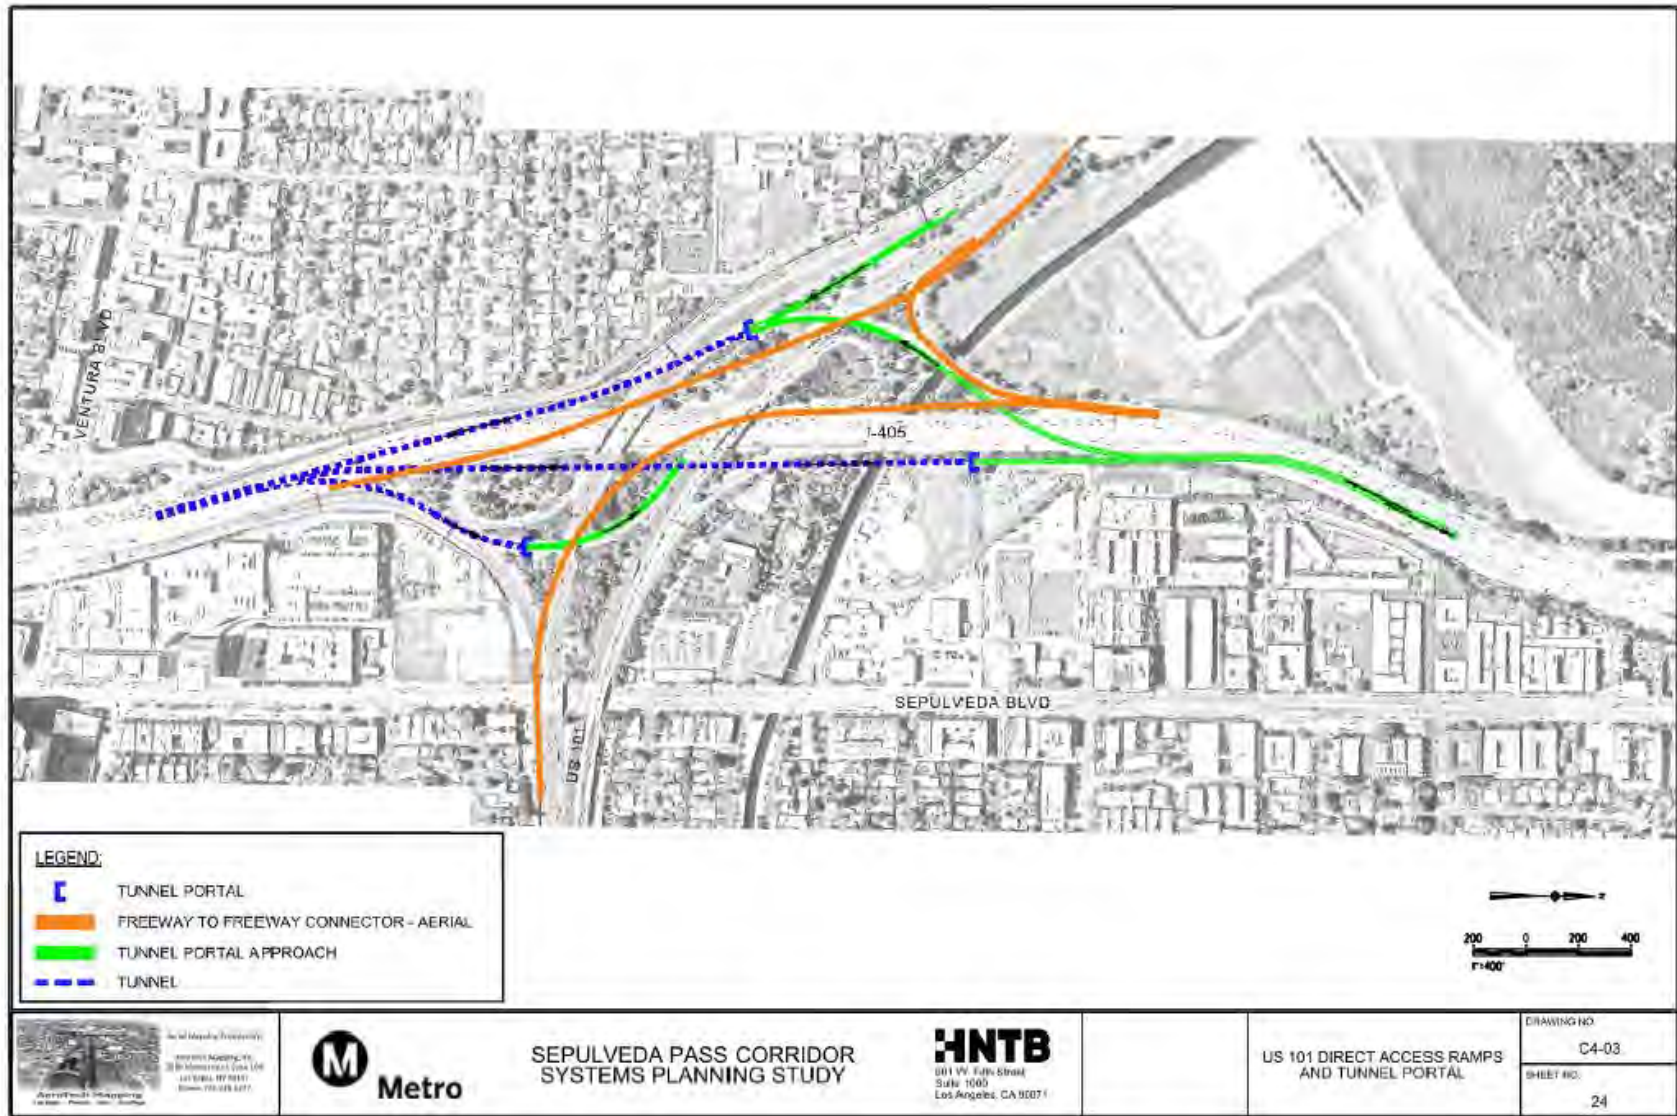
US 101 Direct Access Ramps and Tunnel Portal
